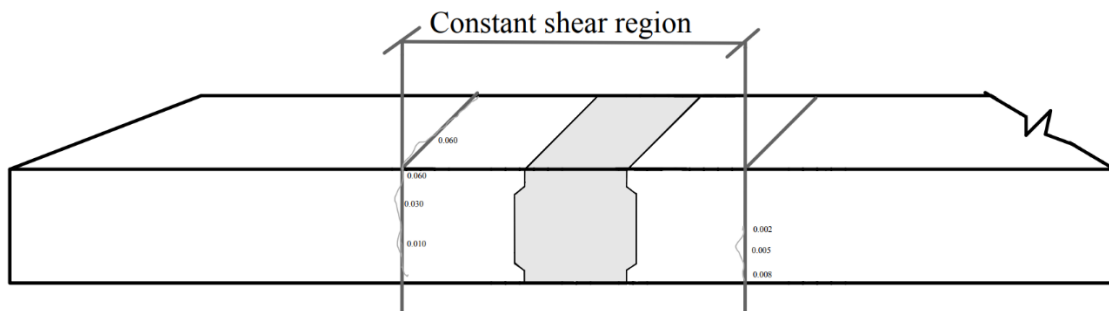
Crack Propagation for Proprietary Long-Term Specimen at 60 % of Final Load
